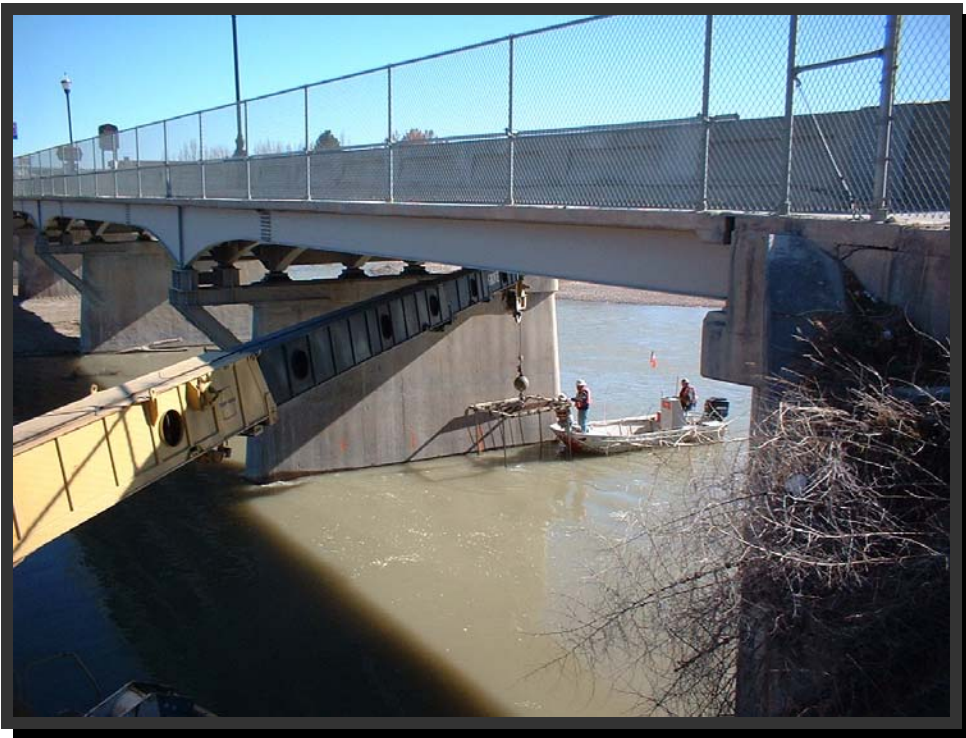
Paint marks on the bridge pier were used to align the A-Jacks modules along the foundation. A small motor boat was used to nudge the modules into the correct placement.
